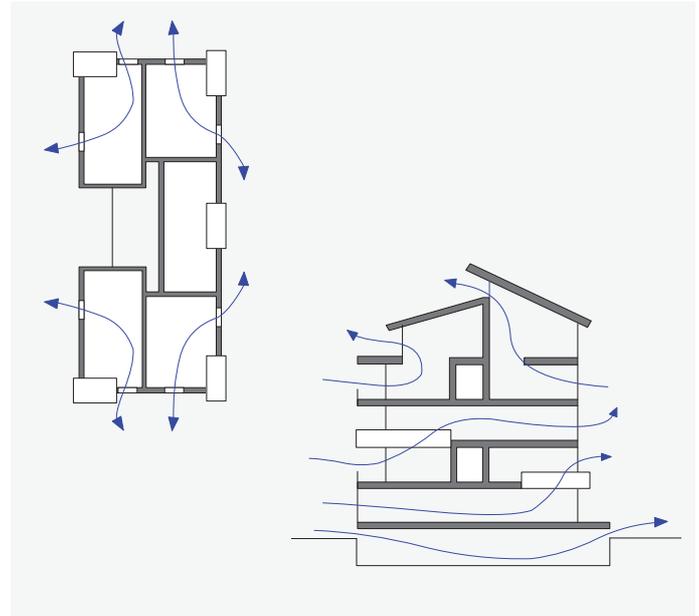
PROPONENTS SHOULD USE BOTH PLAN AND SECTION TO UTILISE THE COOLING EFFECTS OF BREEZE PATHS
